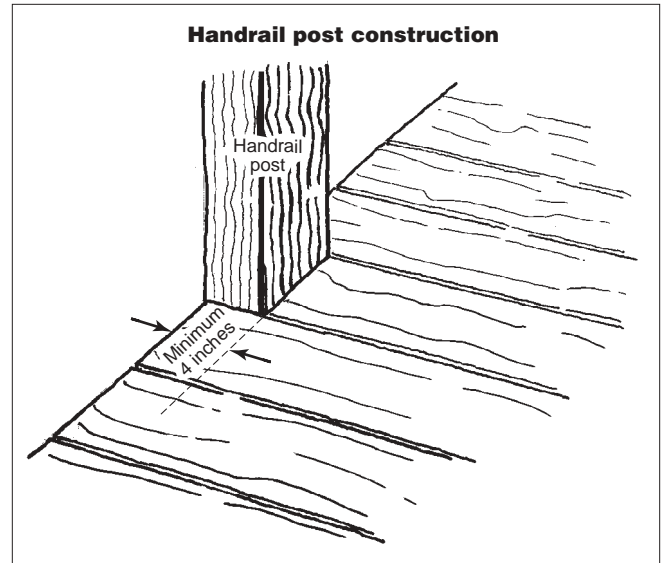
When the handrail post is attached to the stringer below the deck, the decking should extend at least 4 inches beyond the stringer.
